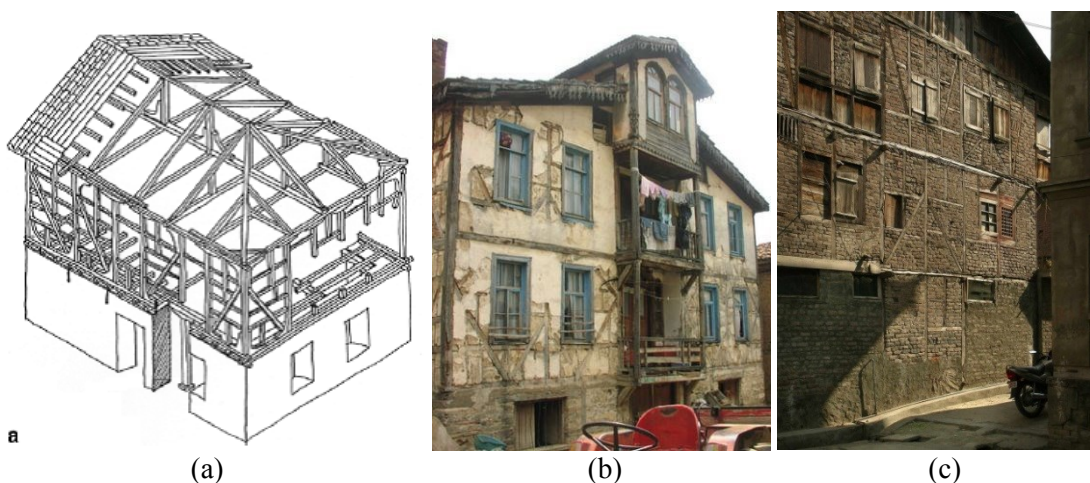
Some examples of timber frame buildings; (a) typical house of Lefkas island in Greece, built with the local aseismic technique [7]; (b) in Turkey - hatil at ground floor and himis in upper storeys [8]; (c) India - dhajji-dewari building in Kashmir [2].
